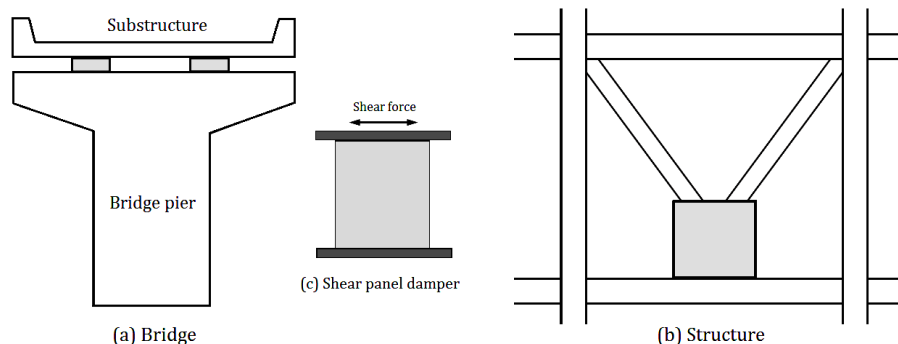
Application of SPD for (a) a girder bridge as bearing; (b) the brace frame
